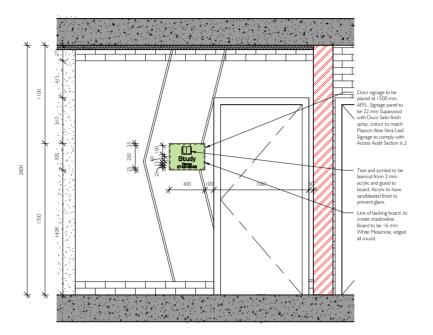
Elevation of amenity door signage (by Author, not tot scale)
